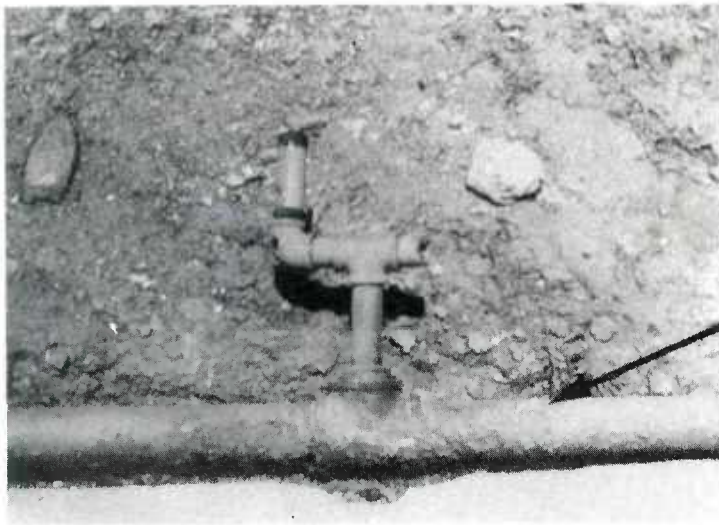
Riser-nozzle assembly 3.6 m standoff.
